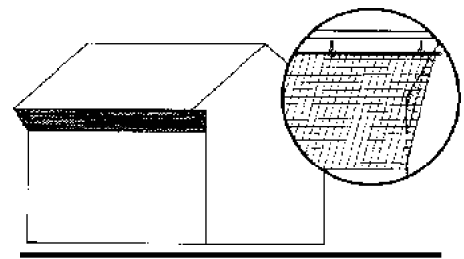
Mount netting from the outer edge of the eave down to the side of the building. Insert shows one possible method of attachment using hooks and wooden dowels.
